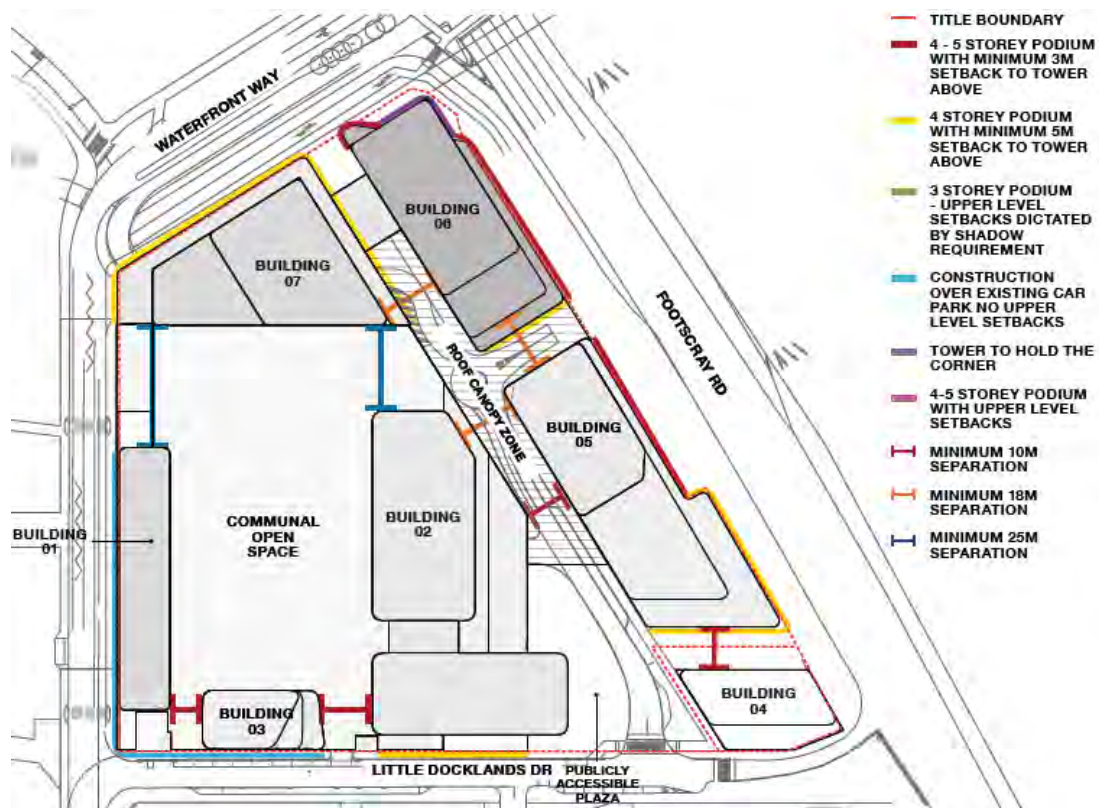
Concept Plan 7 - podium heights, tower setbacks and separation
